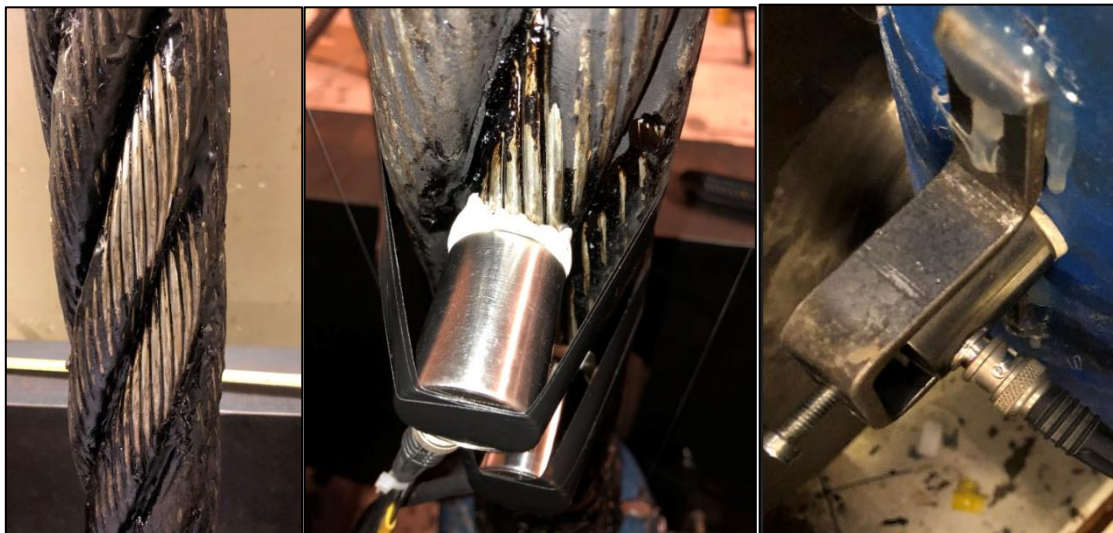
Removing of grease (l). Sensor on cable (m). Sensor on socket (r)
